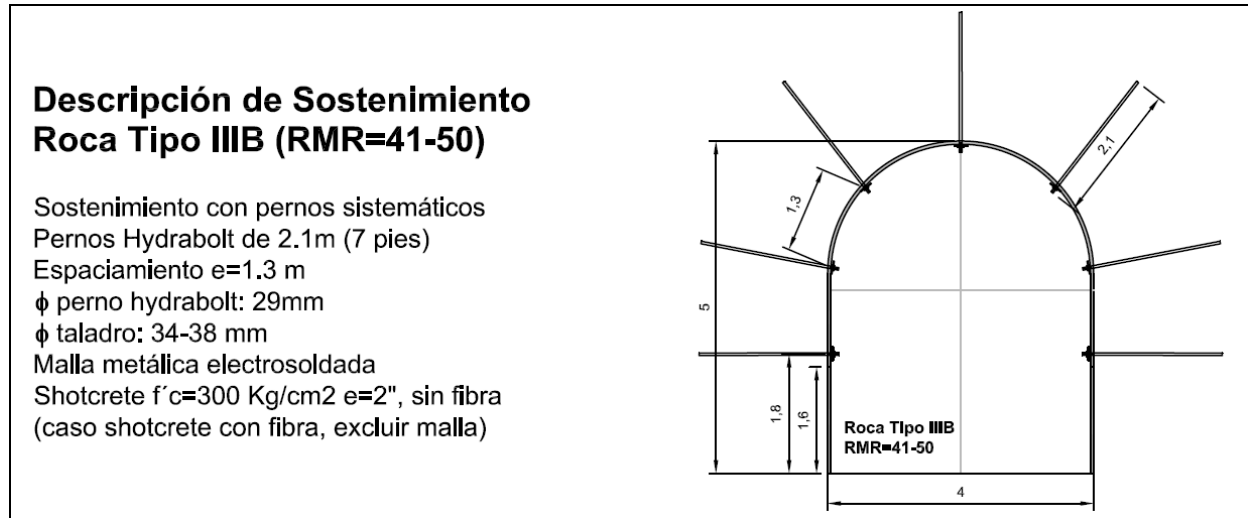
Example of Ground Support Standards - Santa Pancha 1
